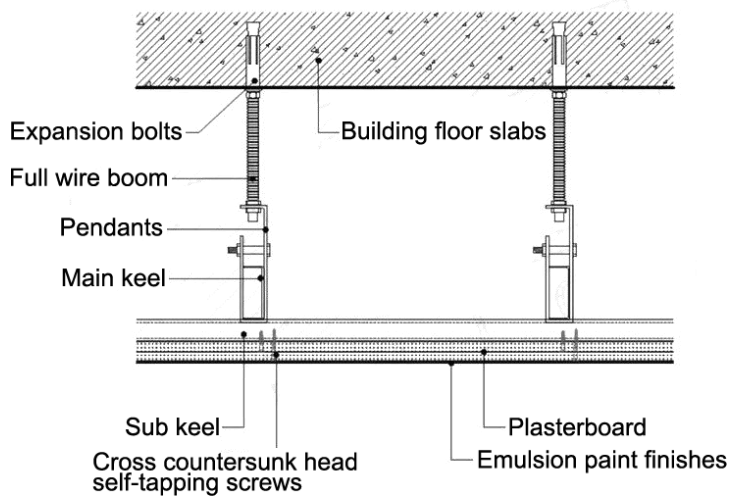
detail drawings of the possible ceiling modular in panel layout and its ceiling structure system
